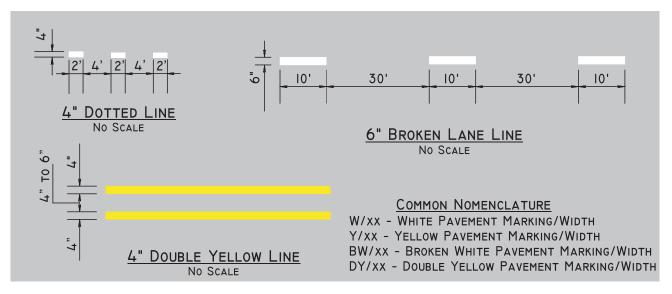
Typical Dimensions of Longitudinal Pavement Markings
